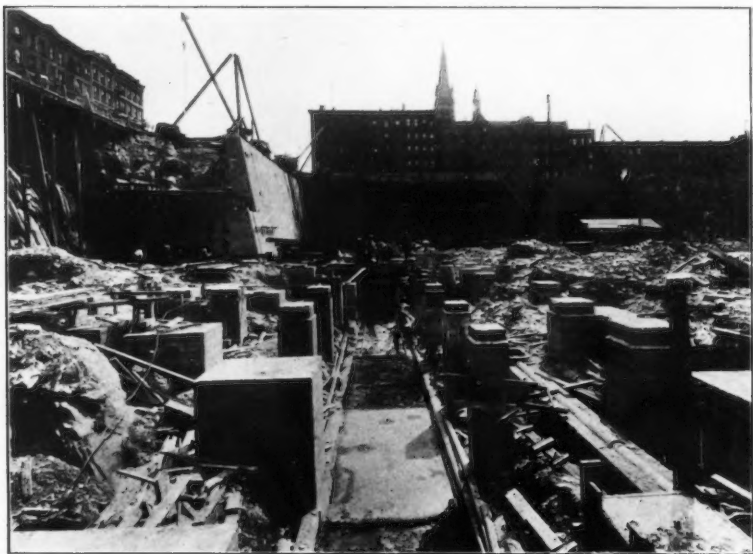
PIPE SUBWAY AND FOUNDATIONS DURING CONSTRUCTION.
